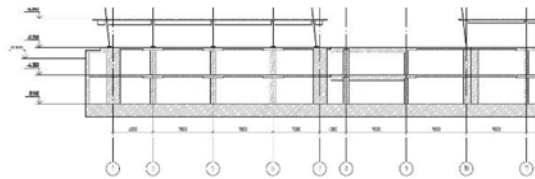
A fragment of substructure (no piles are shown) of the designed multifunctional building across one of sections.
